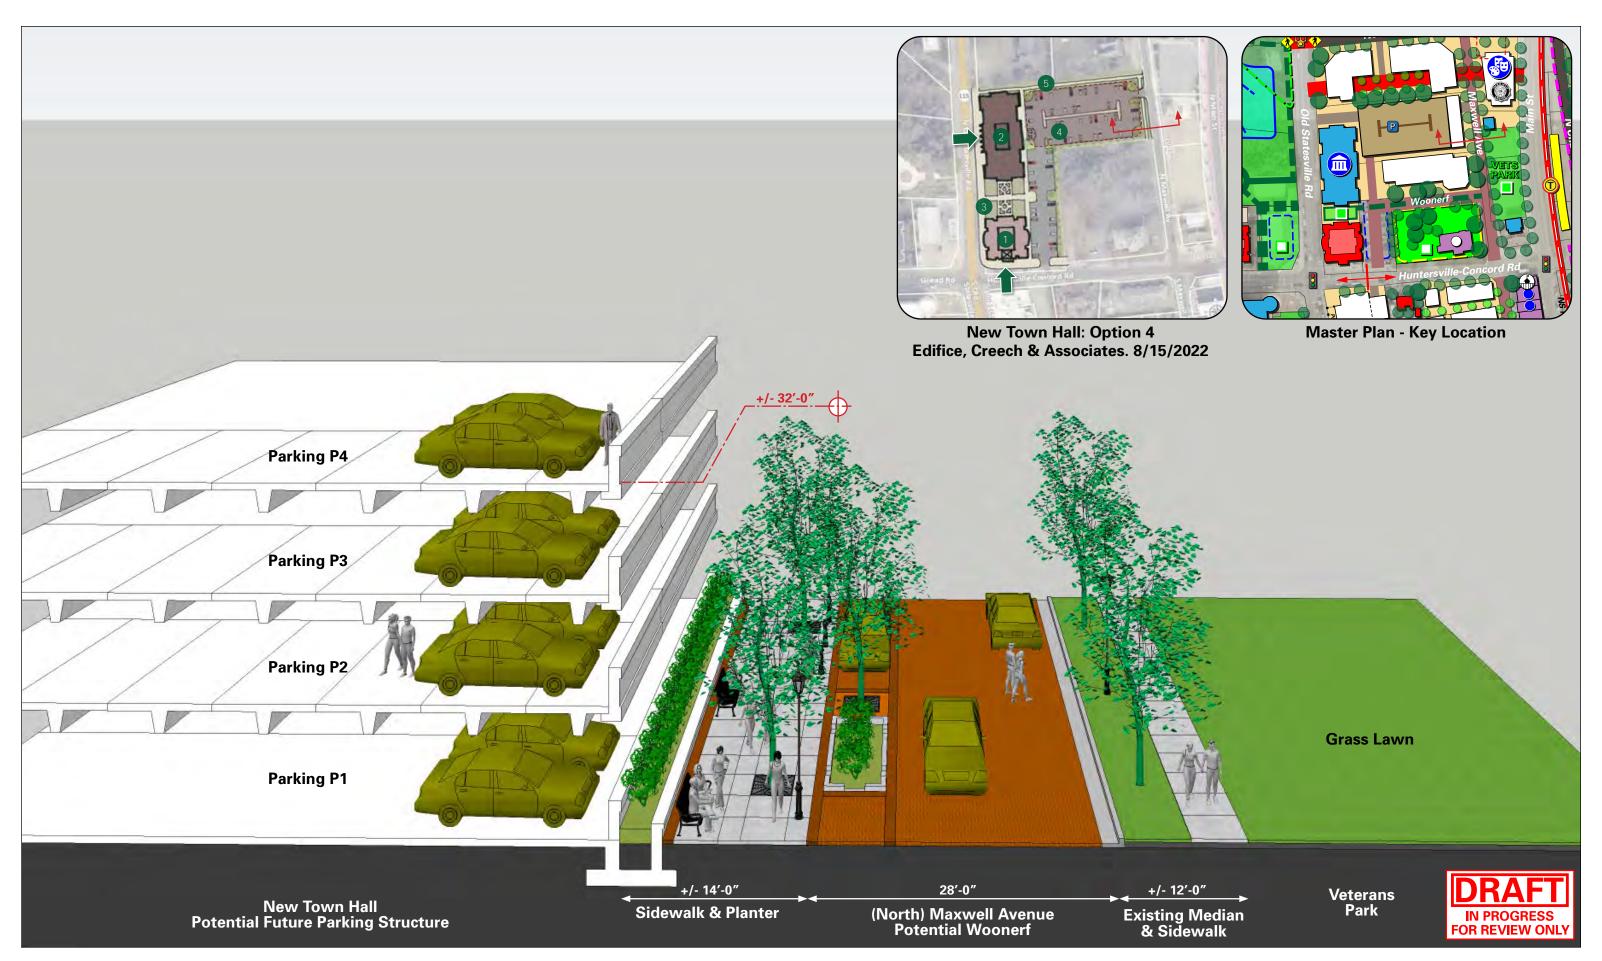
Conceptual Vision Plan: Northwest Quadrant - Future Town Hall Conceptual Parking Structure Frontage along Maxwell Avenue (Proposed Woonerf Street Type): Option A - Single Use and No Setback.
